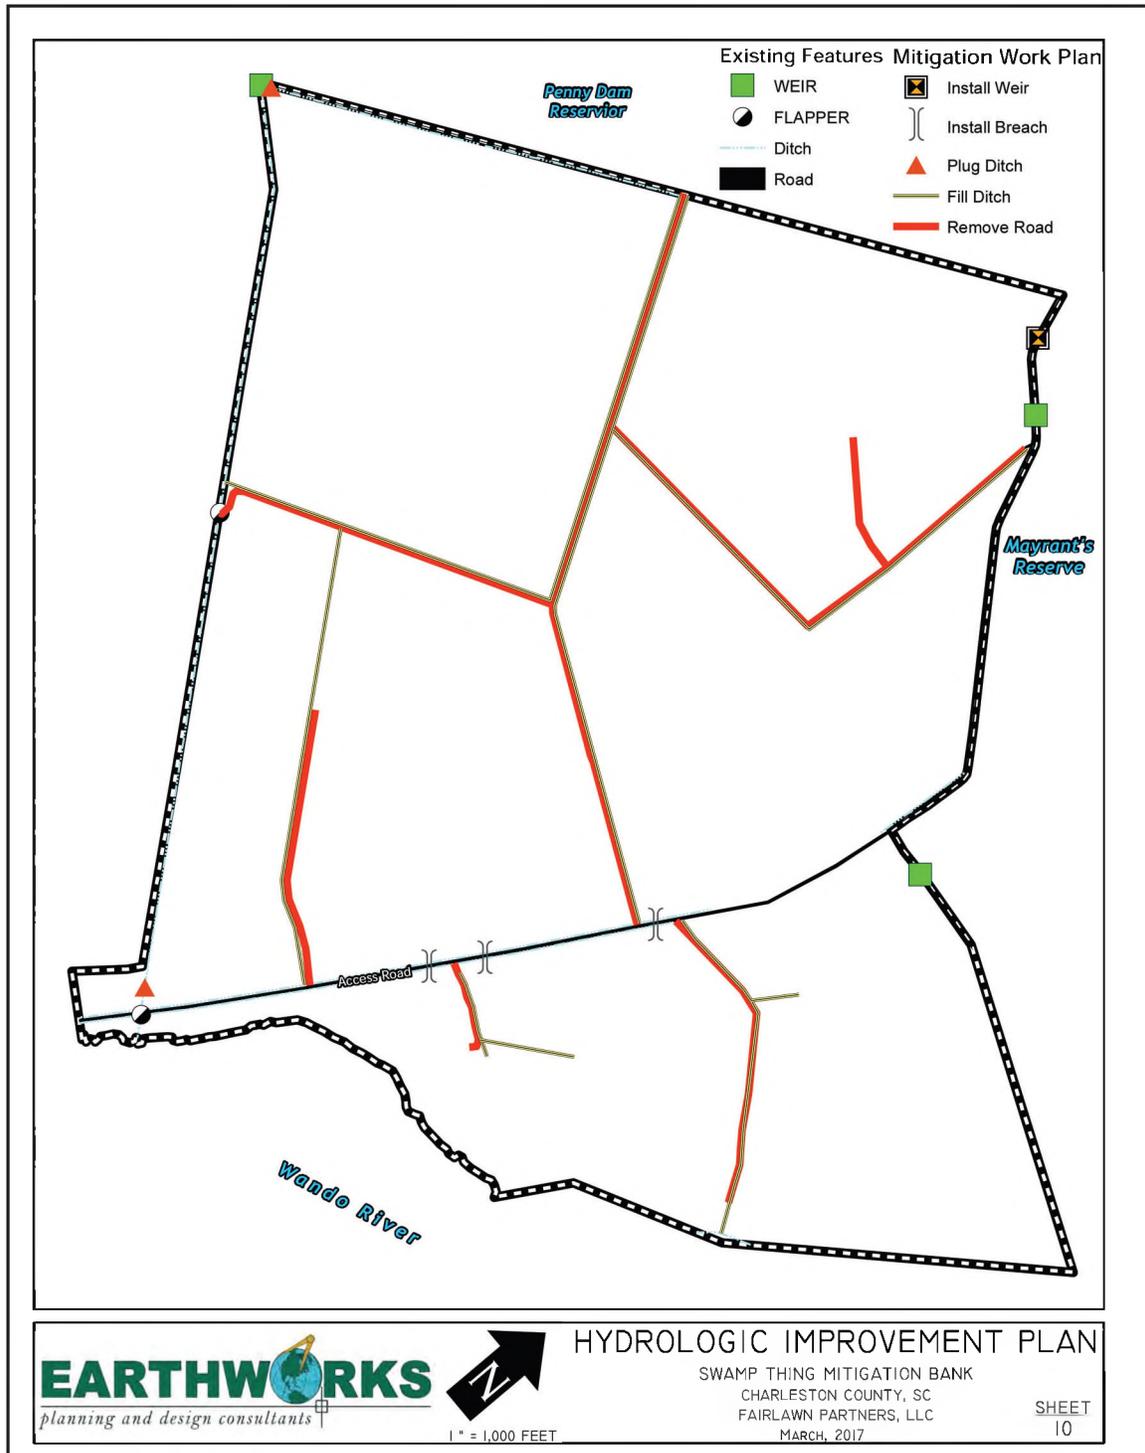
Proposed work plan showing embankments to be reduced to ground level (red) and breached through installation of gravel swales (Earthworks Group Inc. 2017, Sheet 10).
